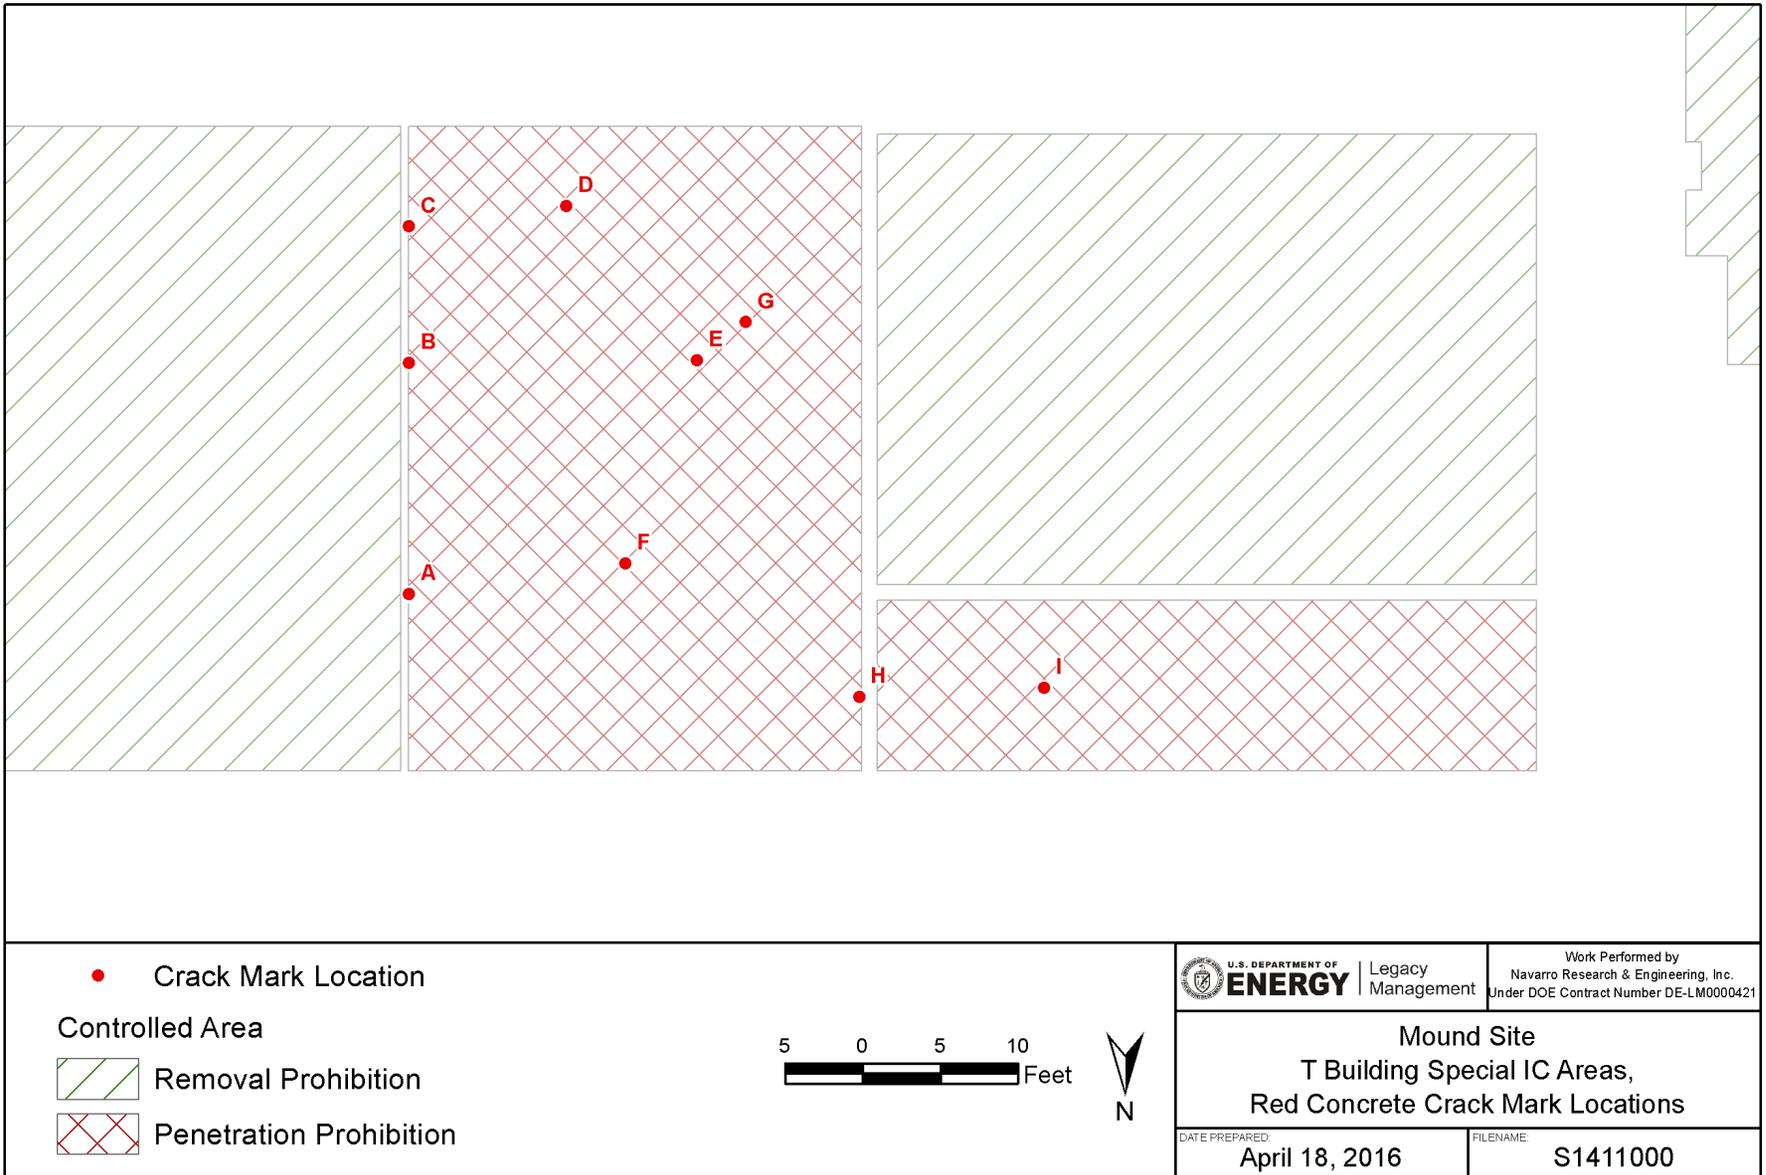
Mound Site, T Building Special IC Areas, Red Concrete Crack Mark Locations
